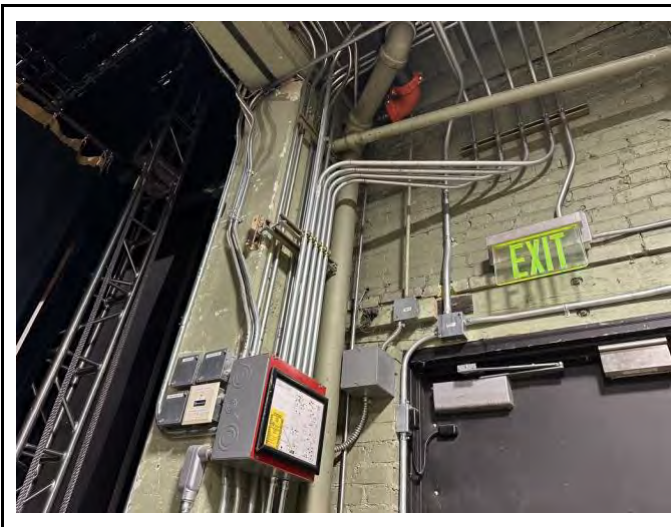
Green painted walls, plaster, and pipes contain lead
